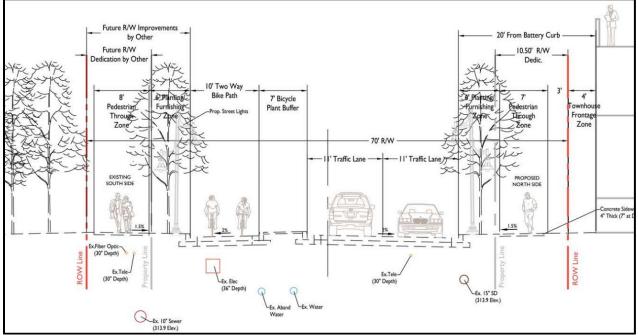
Staff Recommended Separated Bike Facility on south side of Battery Lane looking west
